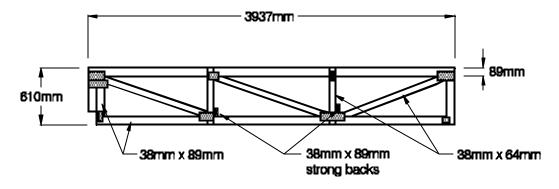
Construction of 610 mm deep wood trusses using 38 x 89 mm lumber.
